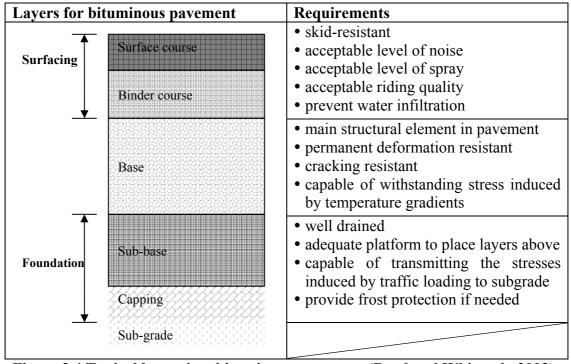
Typical layers in a bituminous pavement (Read and Whiteoak, 2003)
